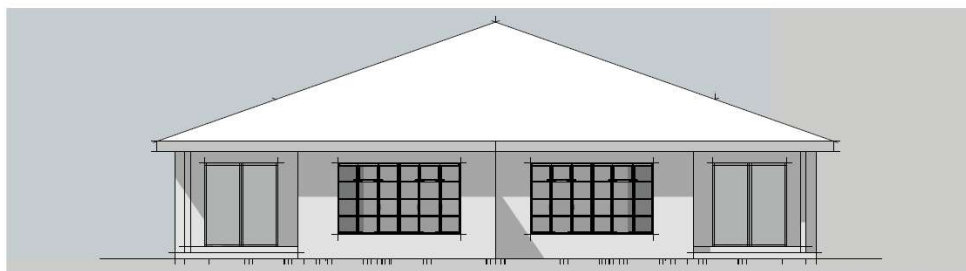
Class 1 Semi Detached House – Sample House Schematic Plans
